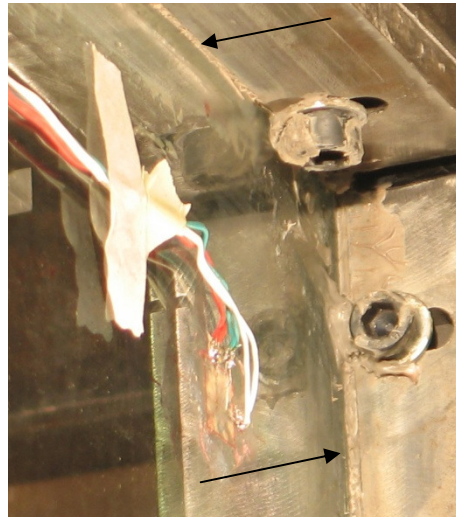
Damaged adhesive bonded joint (HSG 1 just before failure of the glass pane)
